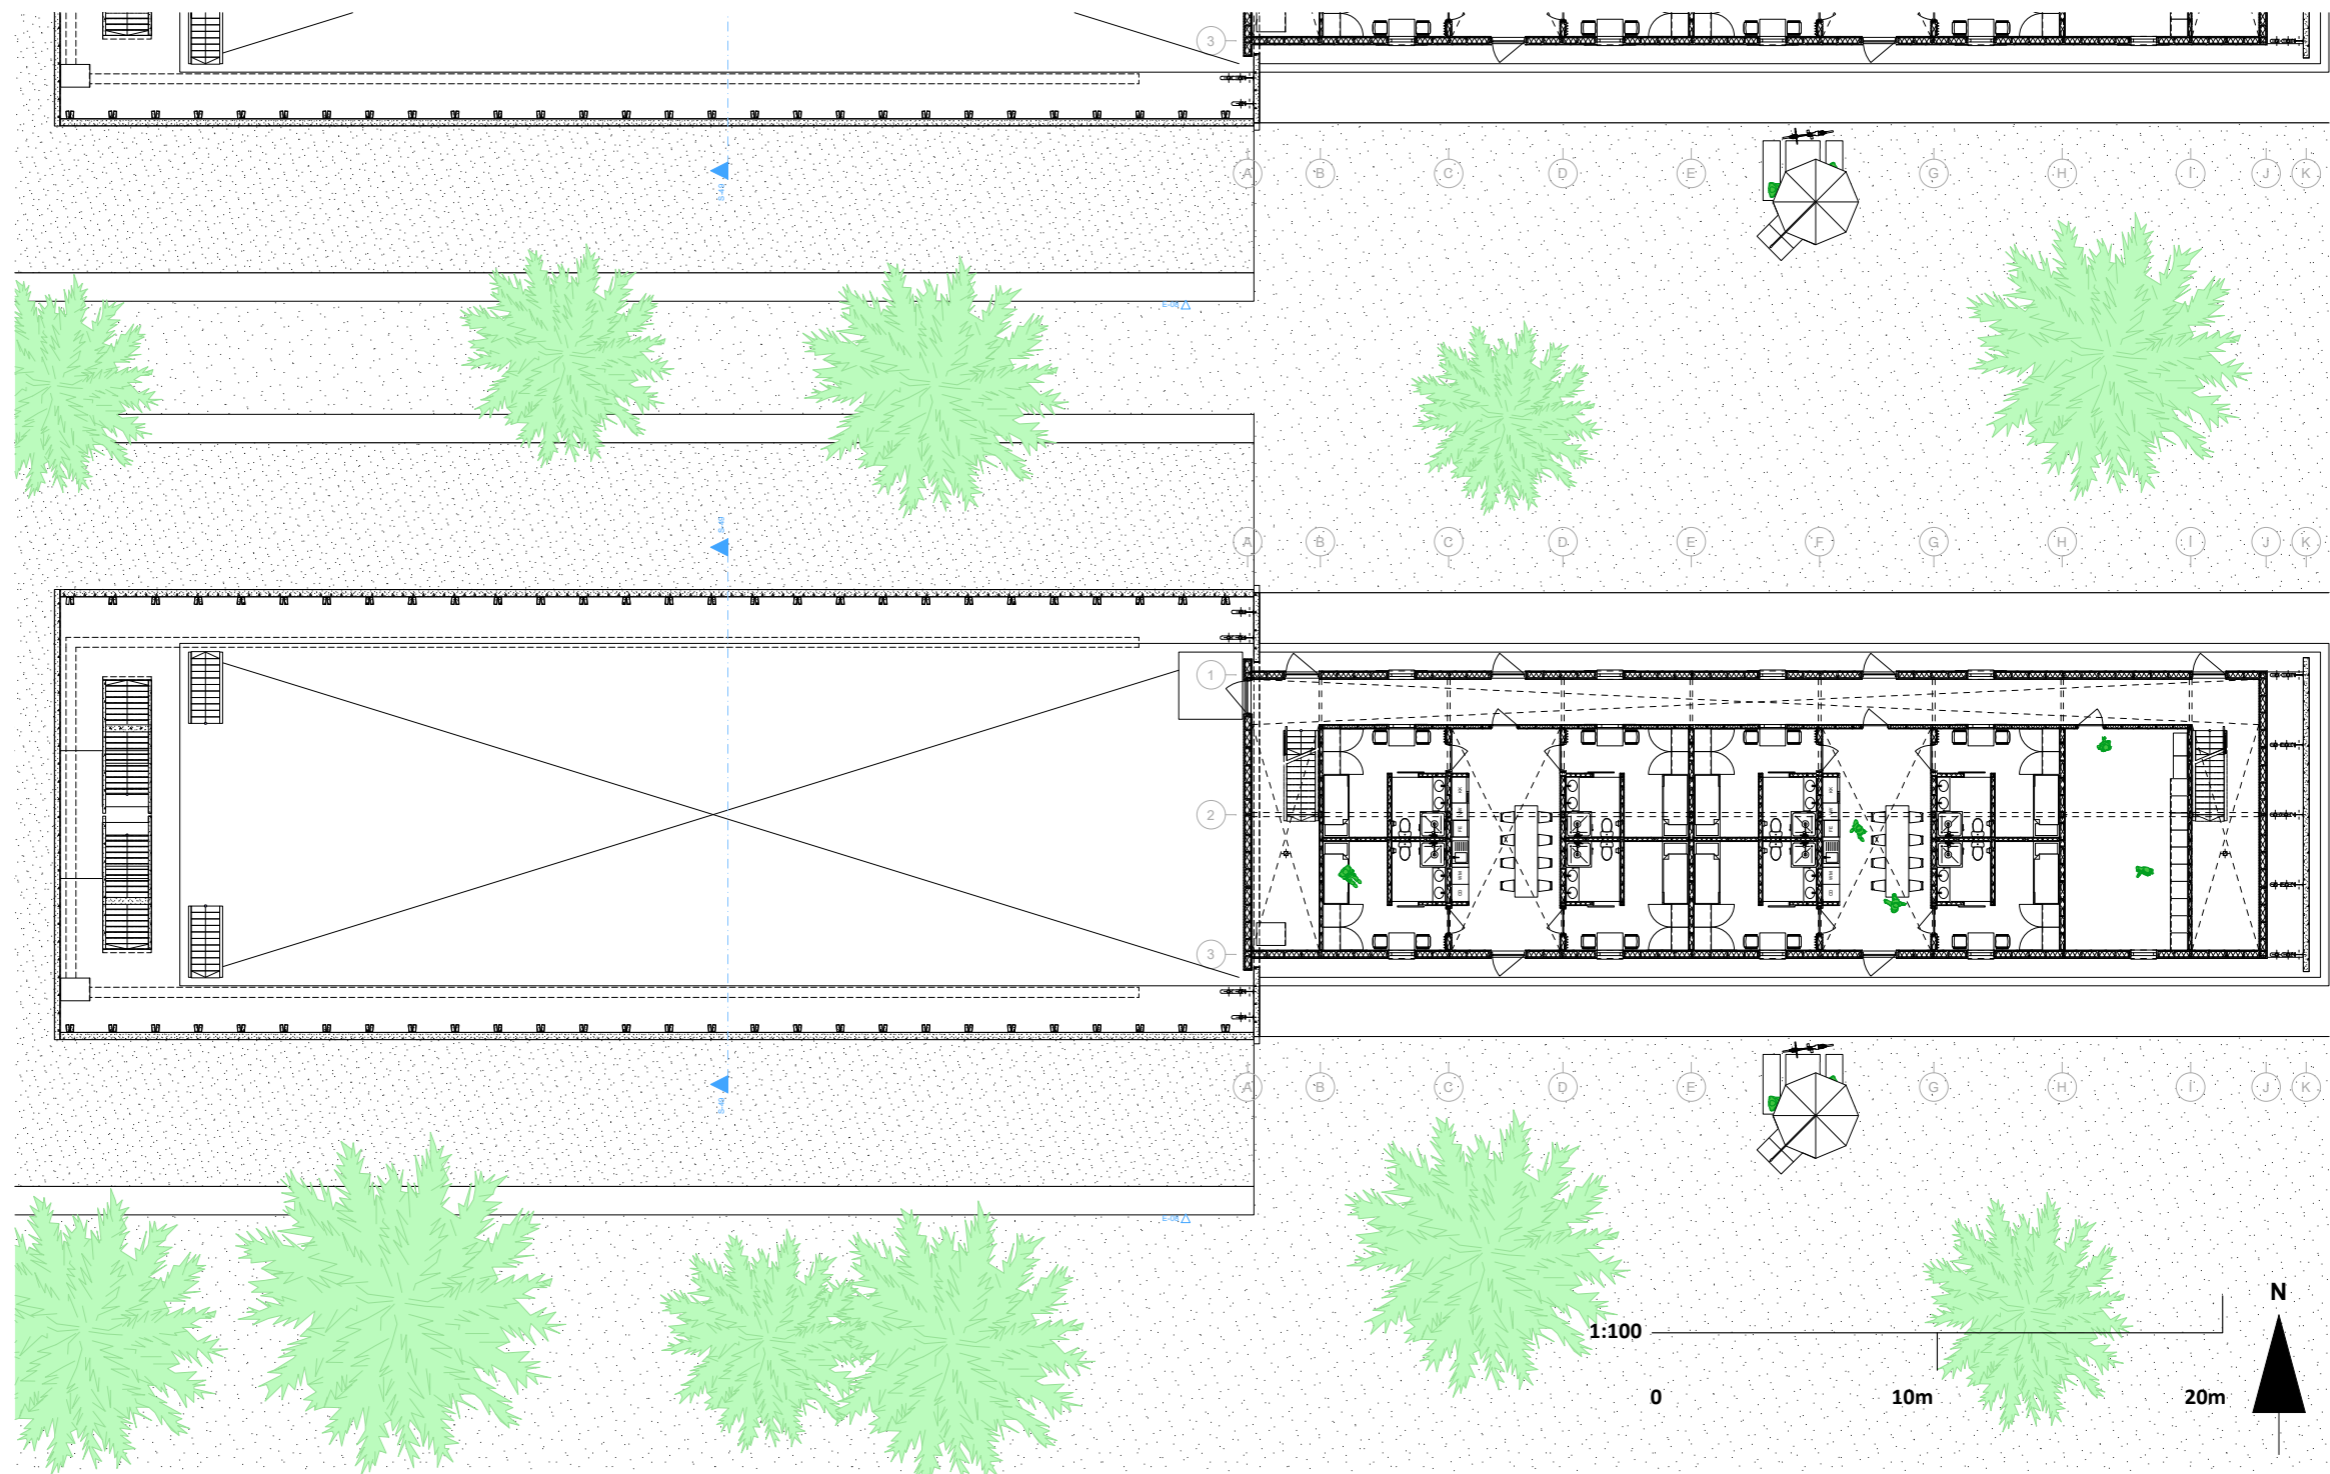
Pre-conflict ground floor section and floorplan – made by author (2026)
